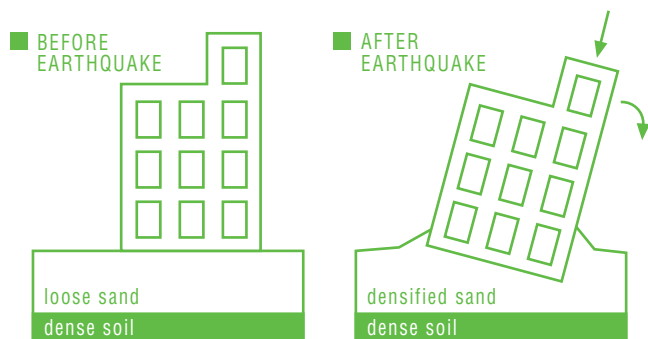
Tilting and toppling of buildings (1964 Niigata Earthquake, Japan).
